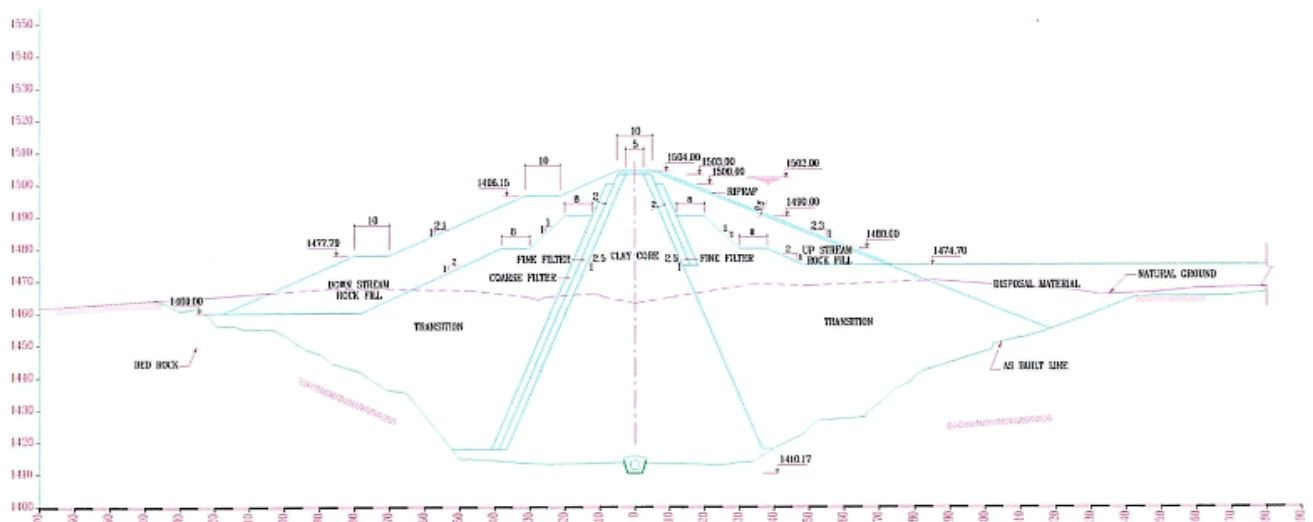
Cross-section of the dam and layers below foundation (section 37)
